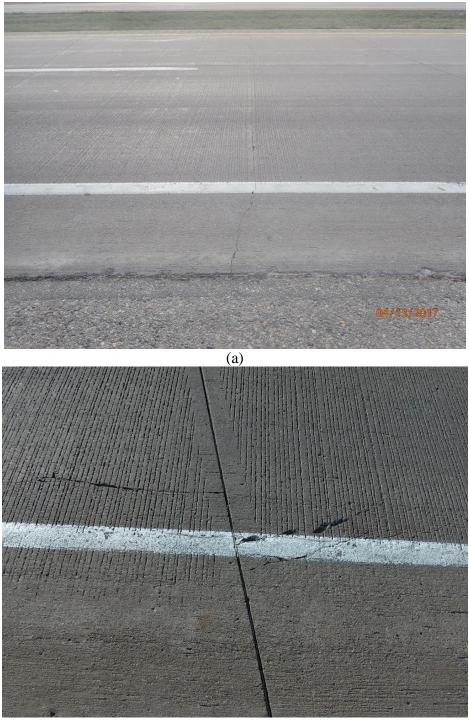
Pavement at LC Site 5 - IA 163 in Jasper County
